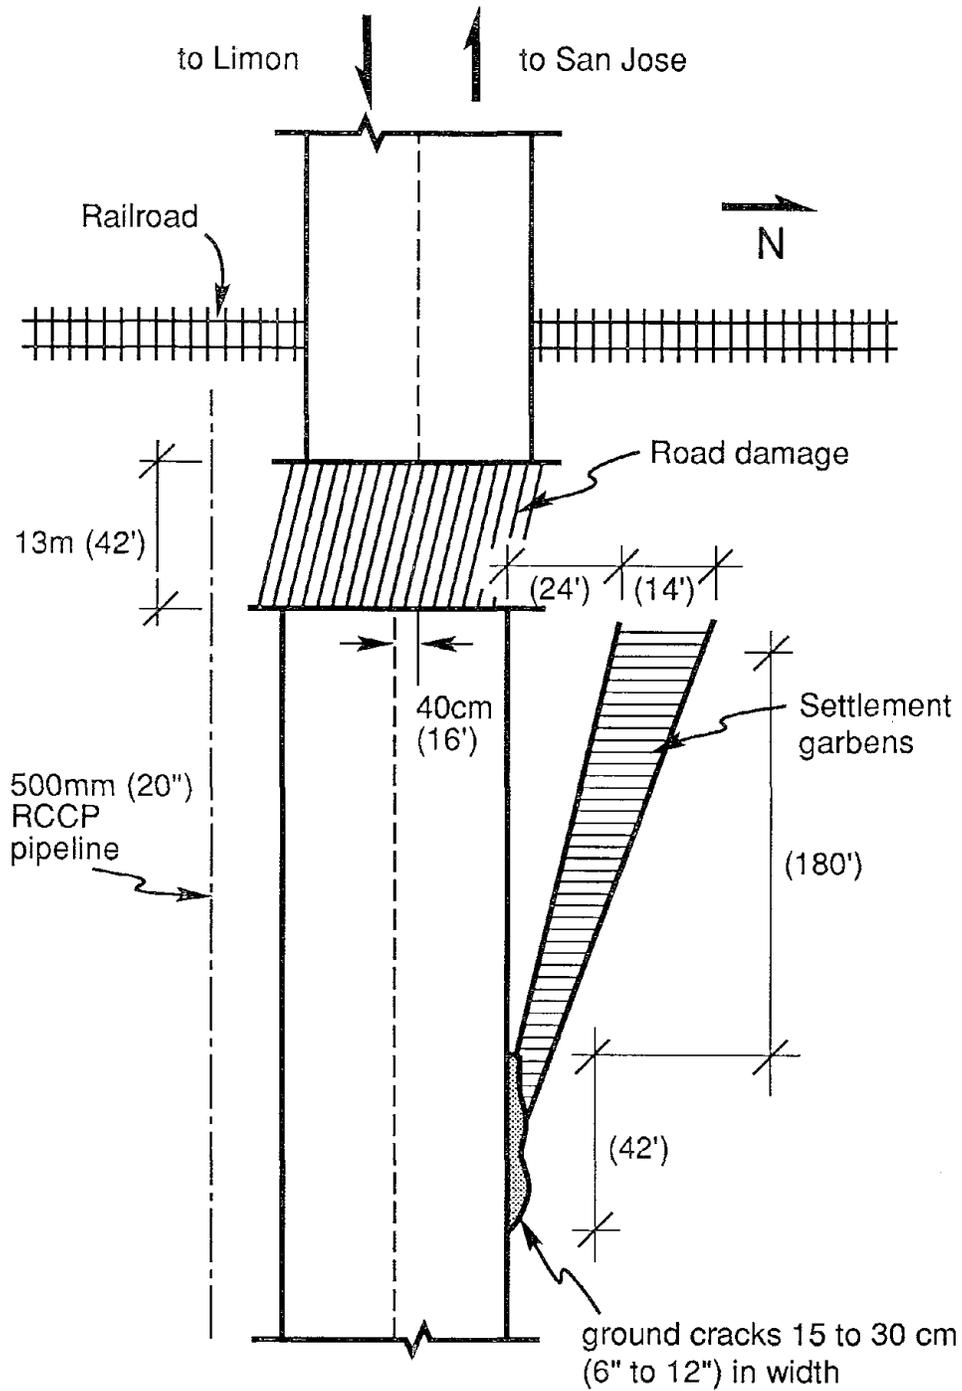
Plan View of Road Damage, Ground Cracks, Garbens and 500 mm (20 inch) RCCP Transmission Pipe Damage Immediately East of Railroad Underpass.
